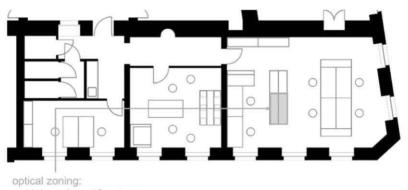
Final layout of the office premise and implemented furniture (plan not to scale).
